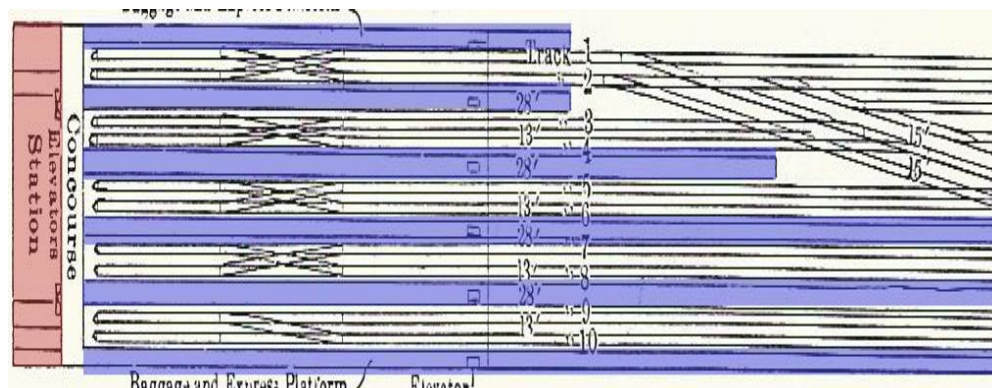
Schematic Plan of showing a railway tracks, platform station building
